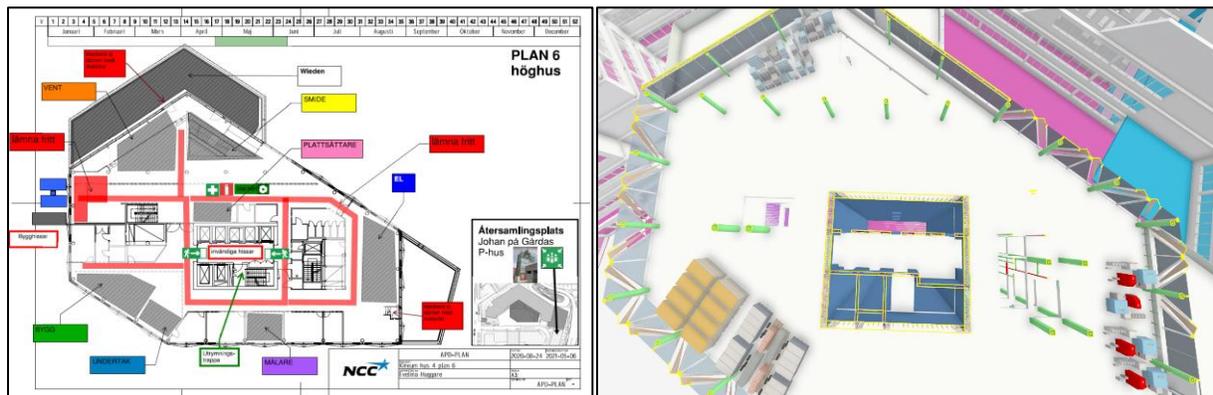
(a) 2D site layout plan of the 6th floor of the Kineum Project (May 2021); (b) simulated site layout plan with subcontractors' materials visible.
